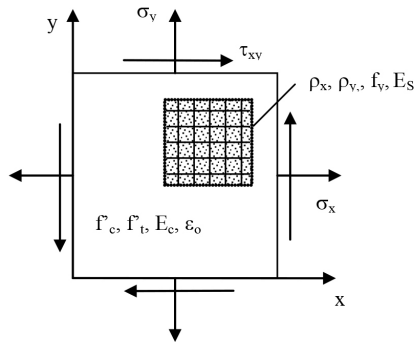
Reinforced concrete membrane element subject to in-plane stresses [Wong and Vecchio, 2002].
